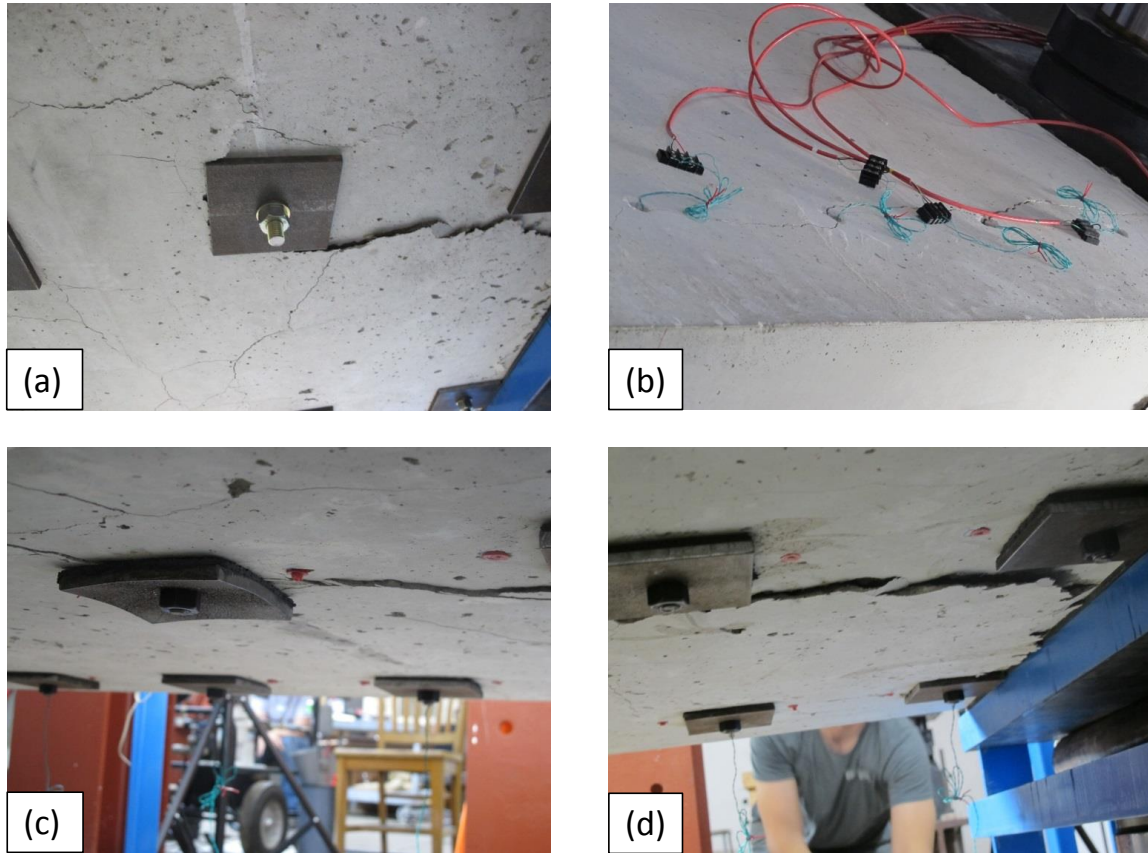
Localized failures of anchor reinforcement. (a) undercut anchor plate “punching through” tension face of beam; (b) splitting between undercut anchor locations; (c) washer plate yielding; (d) structural core concrete failing between regions confined by post-installed anchors.
